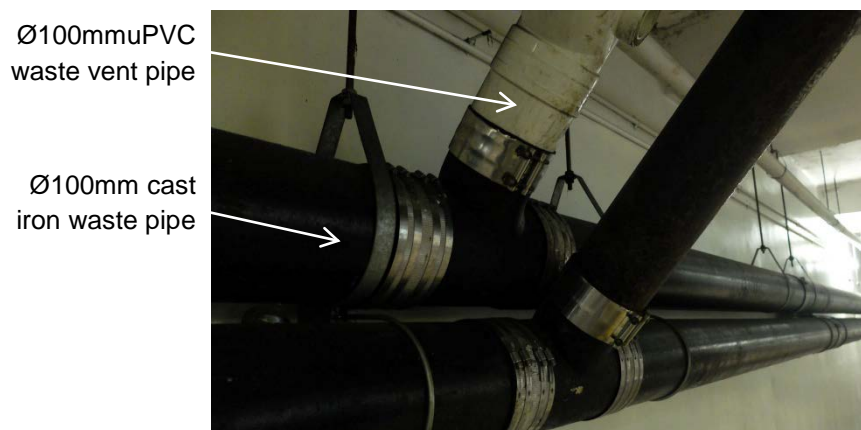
Cast iron waste pipe connecting from restaurant to grease trap.
